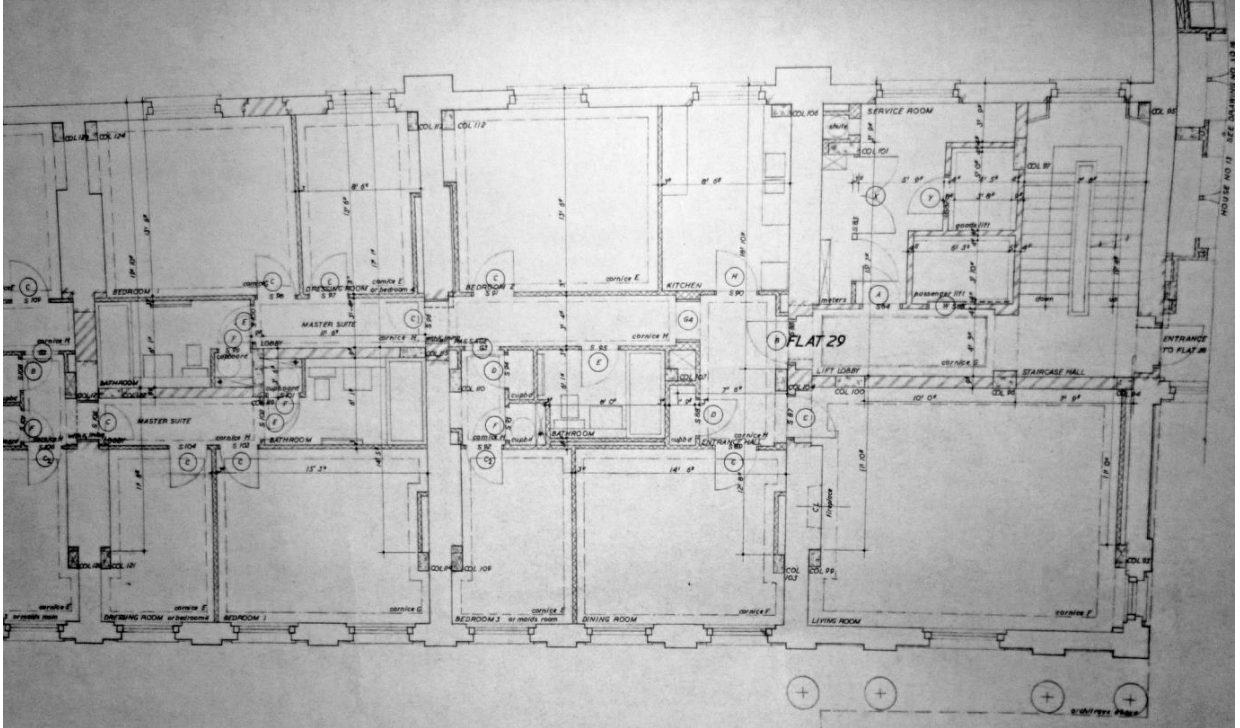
Conversion Plan of Second Floor of Nos. 14-16 Cumberland Terrace.
